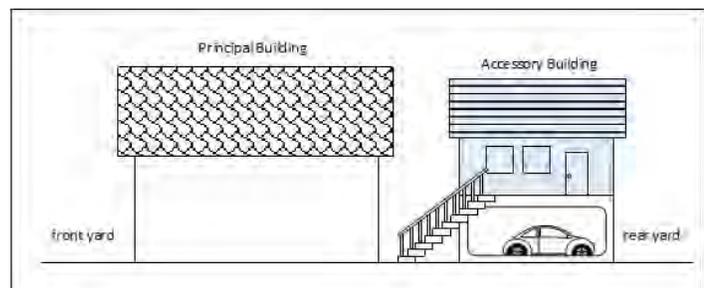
ACCESSORY DWELLING UNIT ATTACHED TO AN ACCESSORY BUILDING.
